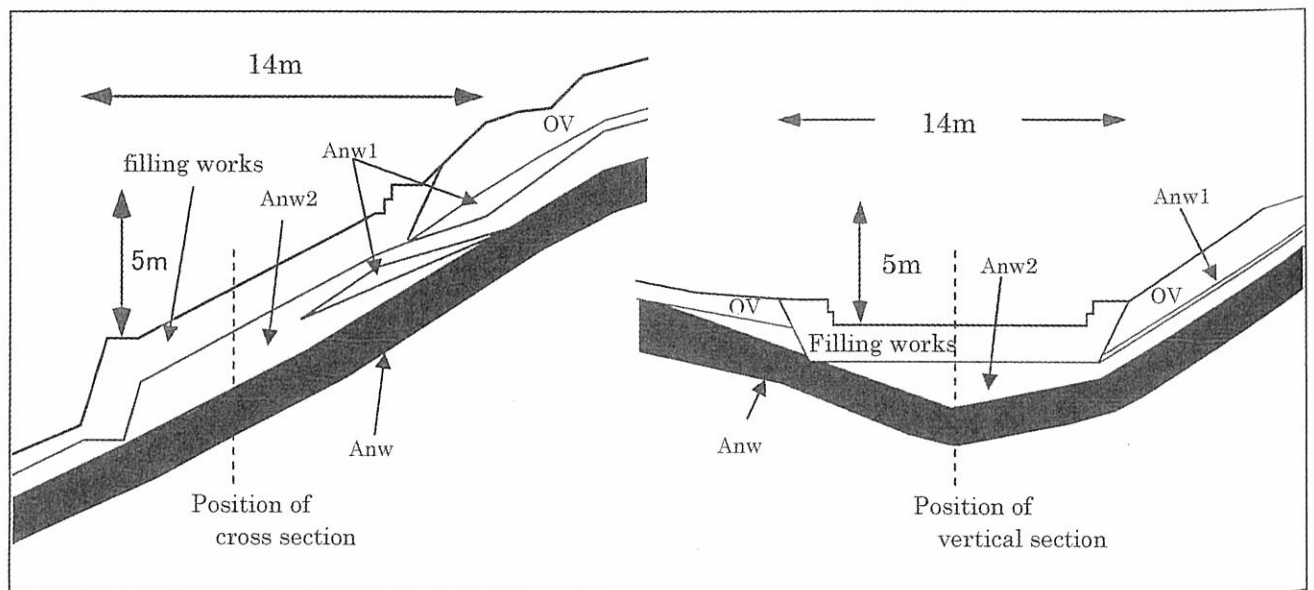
Vertical section(left) and cross section(right) of the slope failure 3
